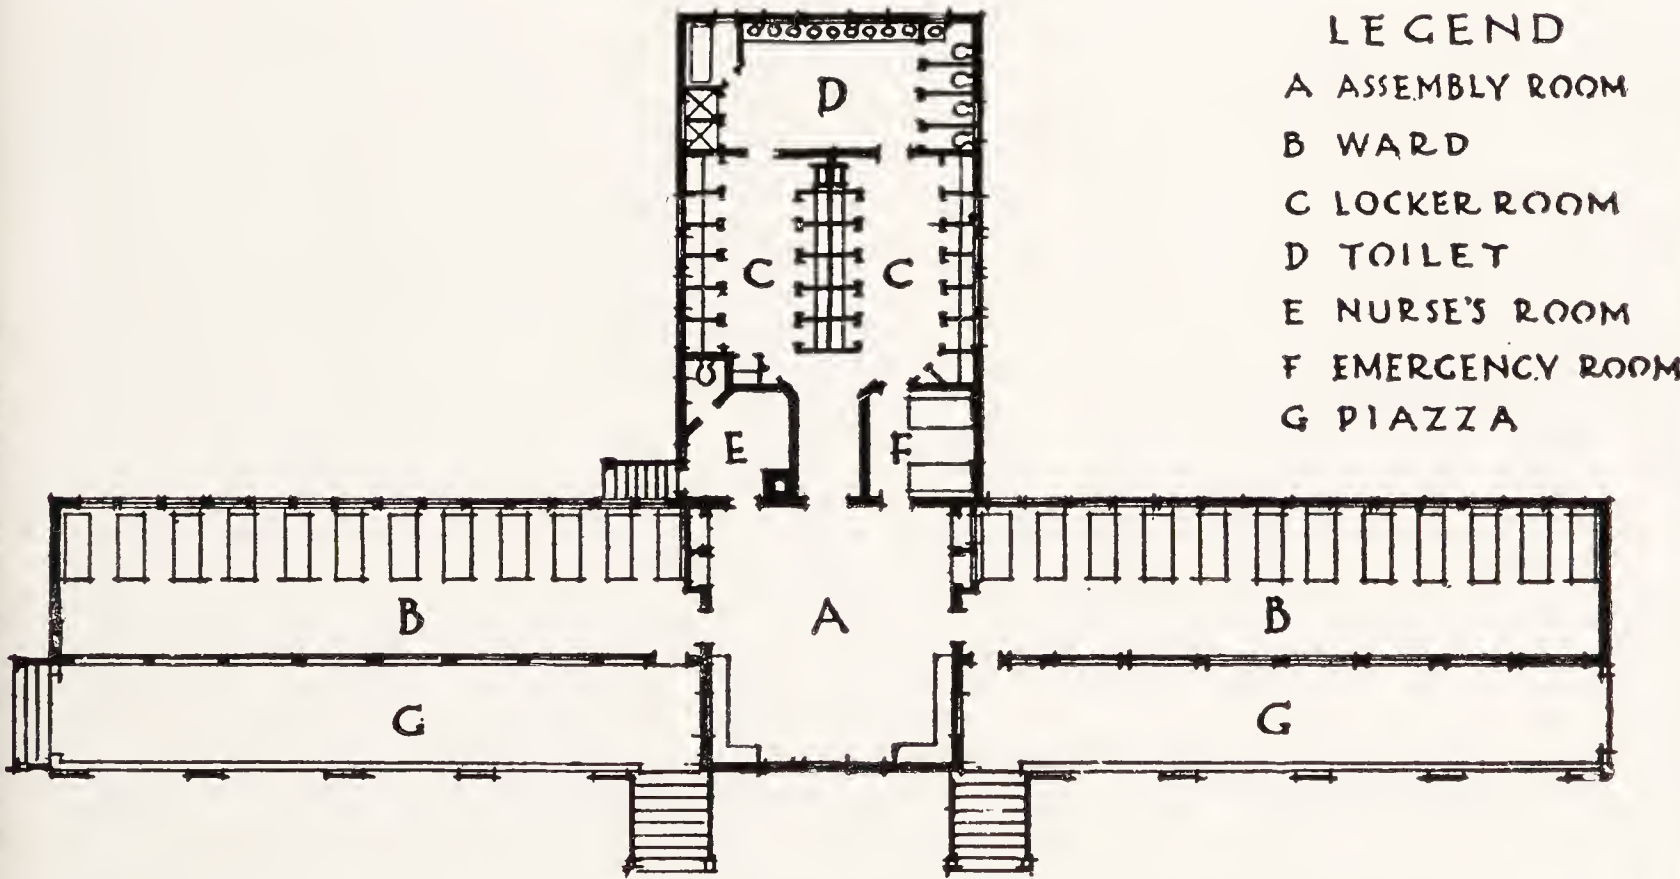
BOSTON CONSUMPTIVES' HOSPITAL, COTTAGE FLOOR PLAN
